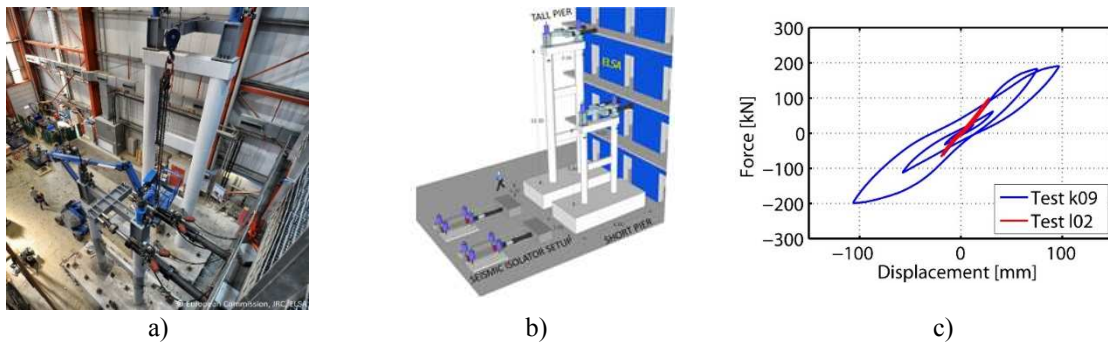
a) 1:2.5 mock-up scale specimens of Piers #9 and #11; b) vertical loading system of frame piers. c) Comparison of hysteretic loops of HS k09 and l02, i.e. as-built and isolated configurations at ULS, respectively, for Pier #9
